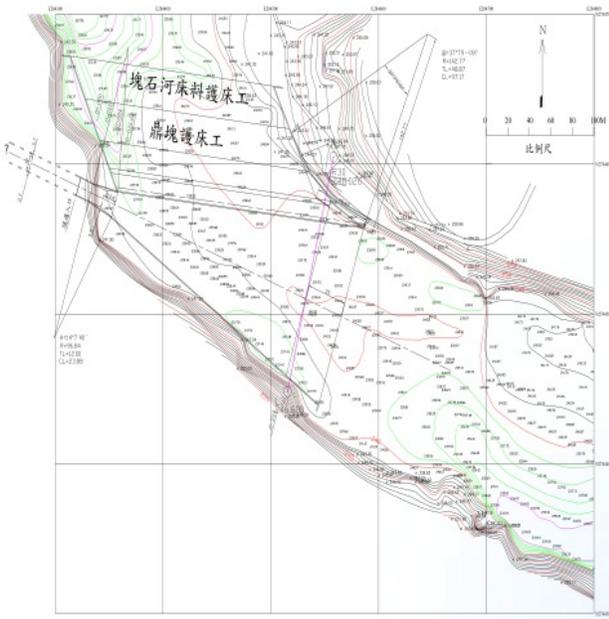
Shihmen Diversion Tunnel A1-1 Inlet Plain Arrangement Graph
